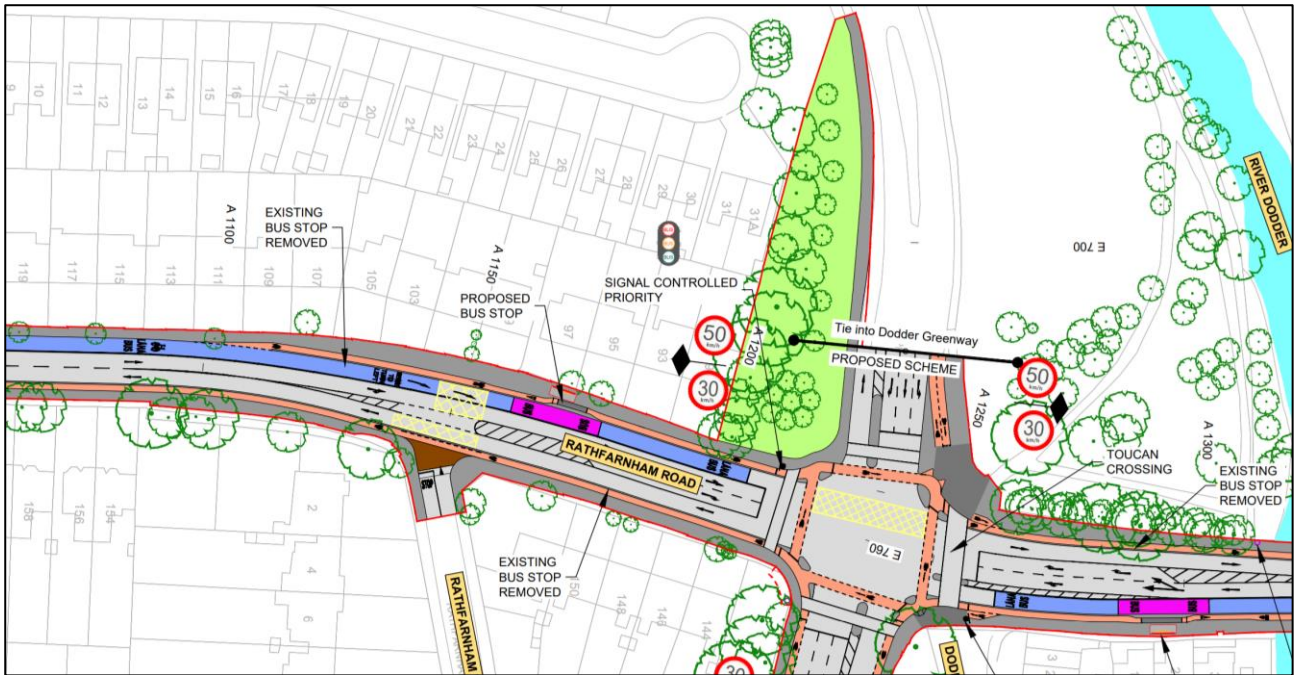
General Arrangement of Proposed Scheme adjacent to junction at Rathfarnham Road and Dodder Park Road Junction (Sheet 04)
